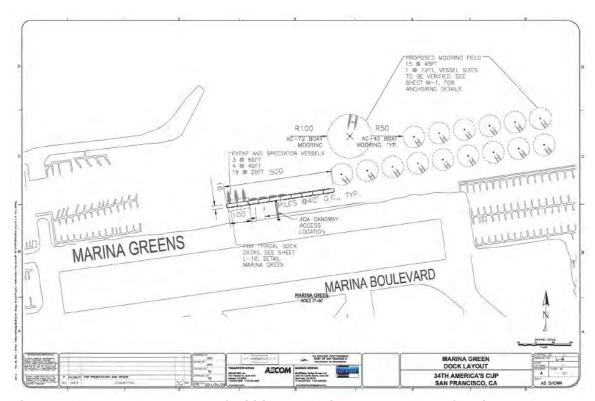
Proposed temporary facilities at Marina Green. Note: floating and fixed breakwaters to be installed prior to AC34 activities as part of West Yacht Harbor Renovation Project are not shown.
